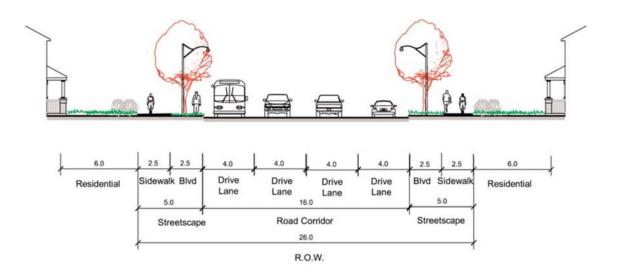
THE QUEENSWAY, KSP PROPOSED CROSS-SECTION (PINE BEACH DRIVE TO MORTON AVENUE)
